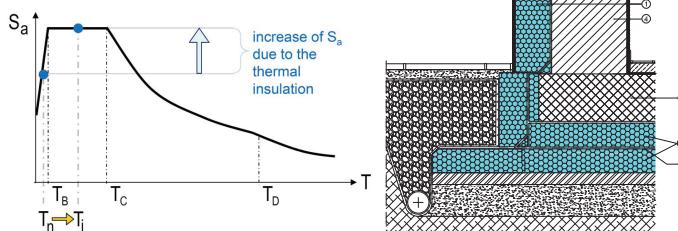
Roof accelerations of the superstructure on thermal insulation (XPS) under the foundation plate
